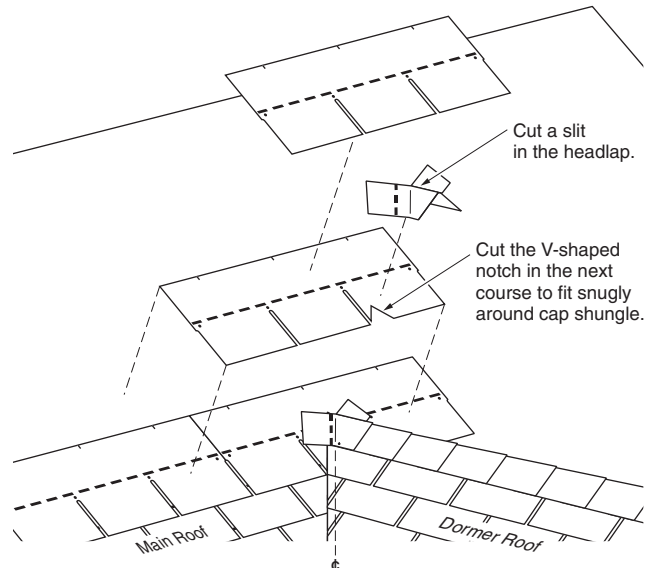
"Exploded" view of the entire assembly where the dormer ridge meets the main roof.
